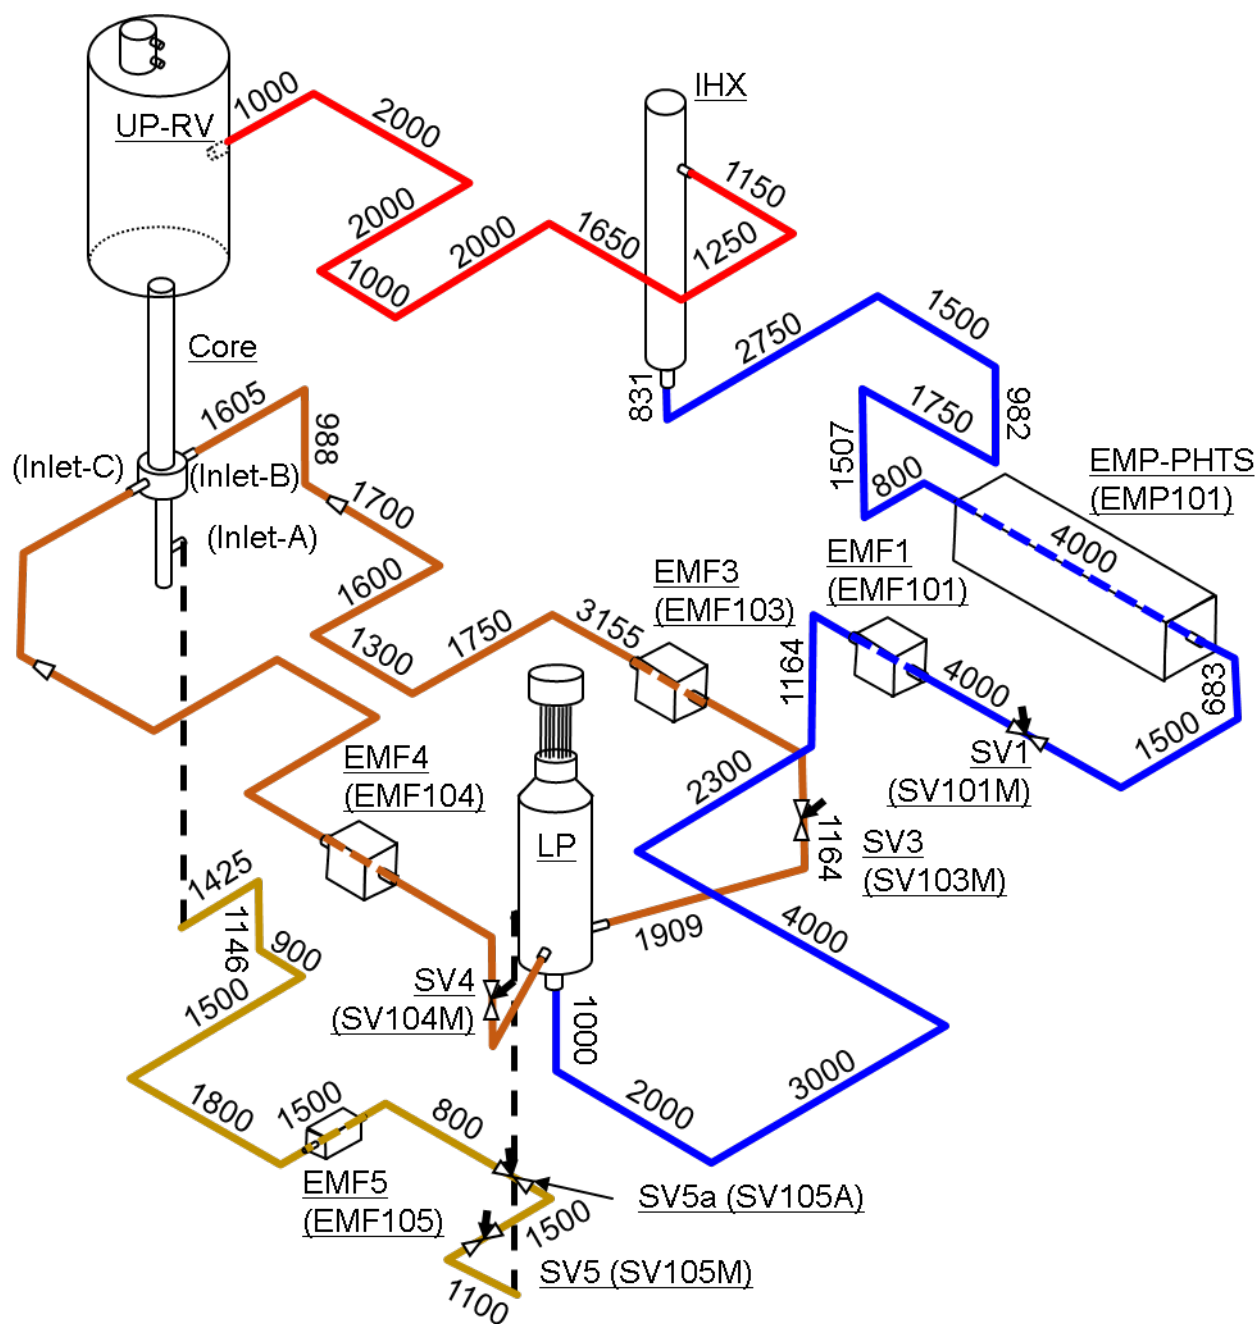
shows the layout of major components and piping in the PHTS. Points to show floor level are located at corners where the angle of piping is changed from horizontal to vertical one or vertical to horizontal one. Sodium heated in the core flowed out from the UP-RV and went to the IHX through the hot-leg piping (red line) of the PHTS. Heat in the PHTS was transferred to the SHTS through the heat transfer straight tubes in the IHX, and the temperature of the sodium in the PHTS was decreased. The sodium at low temperatures in the cold-leg piping (blue line) of the PHTS to the LP was pumped up by EMP-PHTS (EMP101) and went to the LP through the SV1 (SV101M) flow control valve and EMF1 (EMF101). From the LP, the sodium went to the core section through three pipelines to Inlet-A, Inlet-B, and Inlet-C. The pipeline to Inlet-A (light brown line) was connected to the center assembly through the two valves, SV5 (SV105M) and SV5a (SV105A), and a flowmeter, EMF5 (EMF105). Another pipeline to Inlet-B (dark brown line) was connected to one side-core region consisting of three outer assemblies of A, B, and C via the SV3 (SV103M) valve and the EMF3 (EMF103) flowmeter. The other pipeline to Inlet-C (dark brown line) was connected to the opposite side-core region consisting of another three outer assemblies of D, E, and F via the SV4 (SV104M) valve and the EMF4 (EMF104) flowmeter. The pipe diameter of the PHTS from the RV outlet to the LP inlets was 4 inches and those from the LP outlet to the core inlets were 2 inches. Table 4 lists the specifications of piping in the PHTS. Figure 16 shows the elevations of components in the PHTS of PLANDTL-DHX. Table 5 lists the major specifications of EMP in the PHTS (EMP-PHTS).
